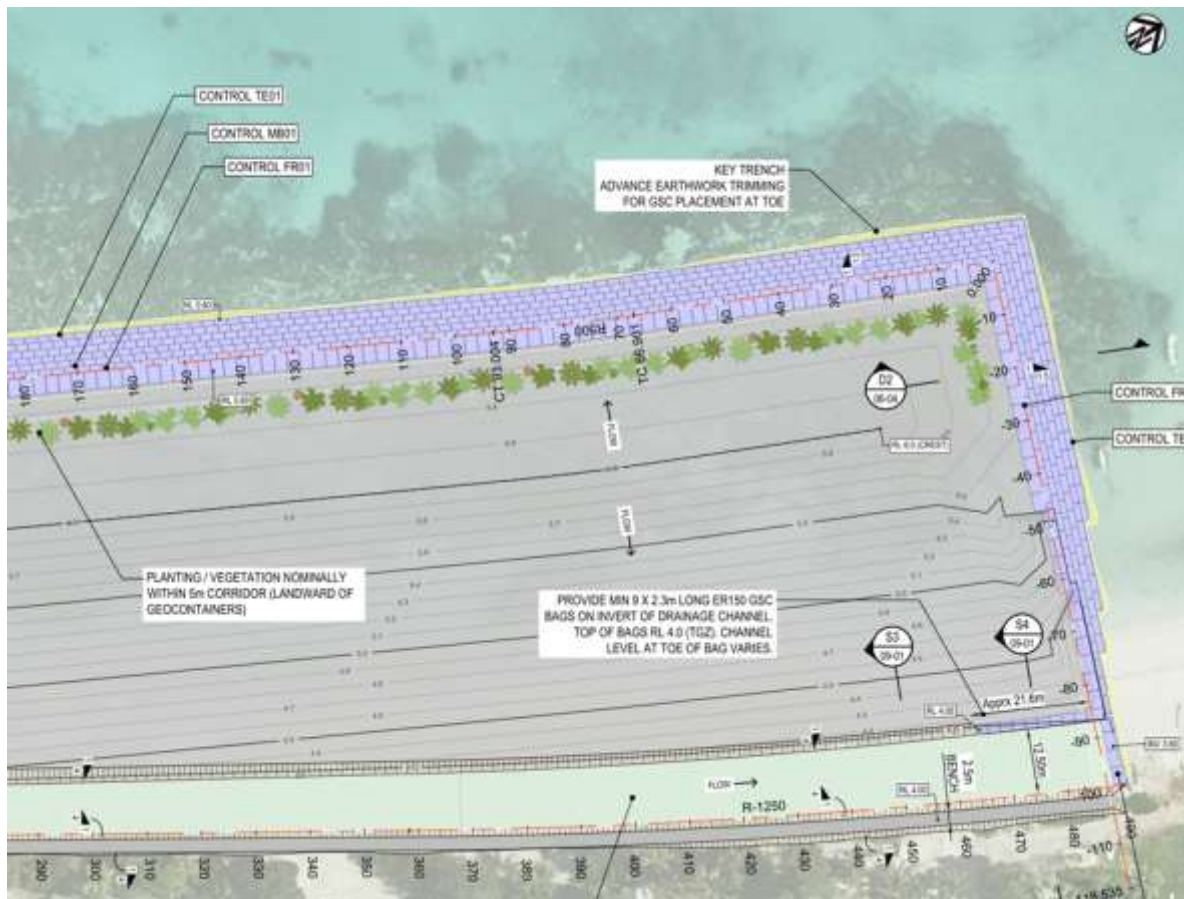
Plan view of northern end of proposed TCAP II reclamation showing grading of surface, setback, and drainage.
